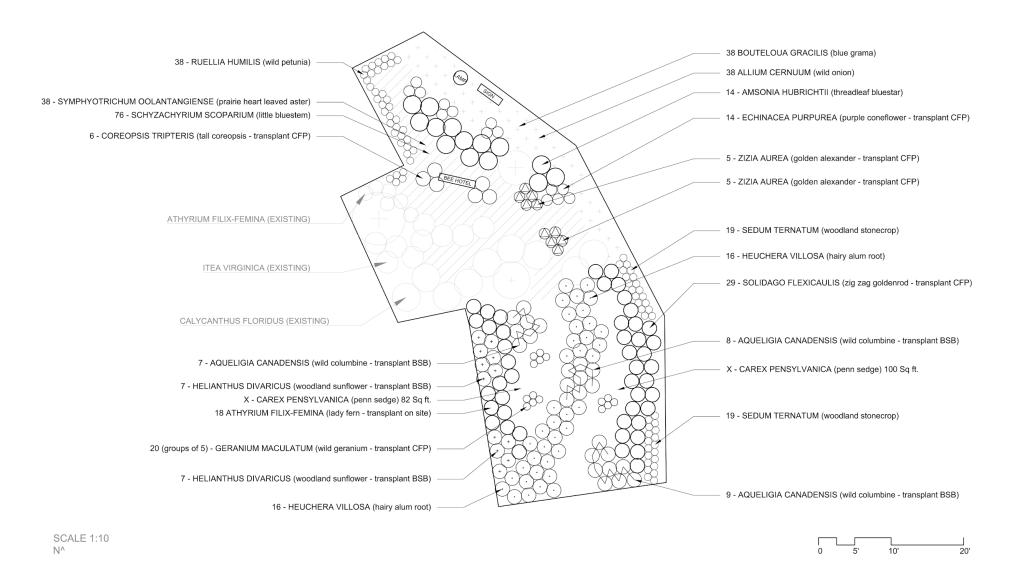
Fall 2020 Planting plan for Biological Sciences Building Pollinator Garden.
